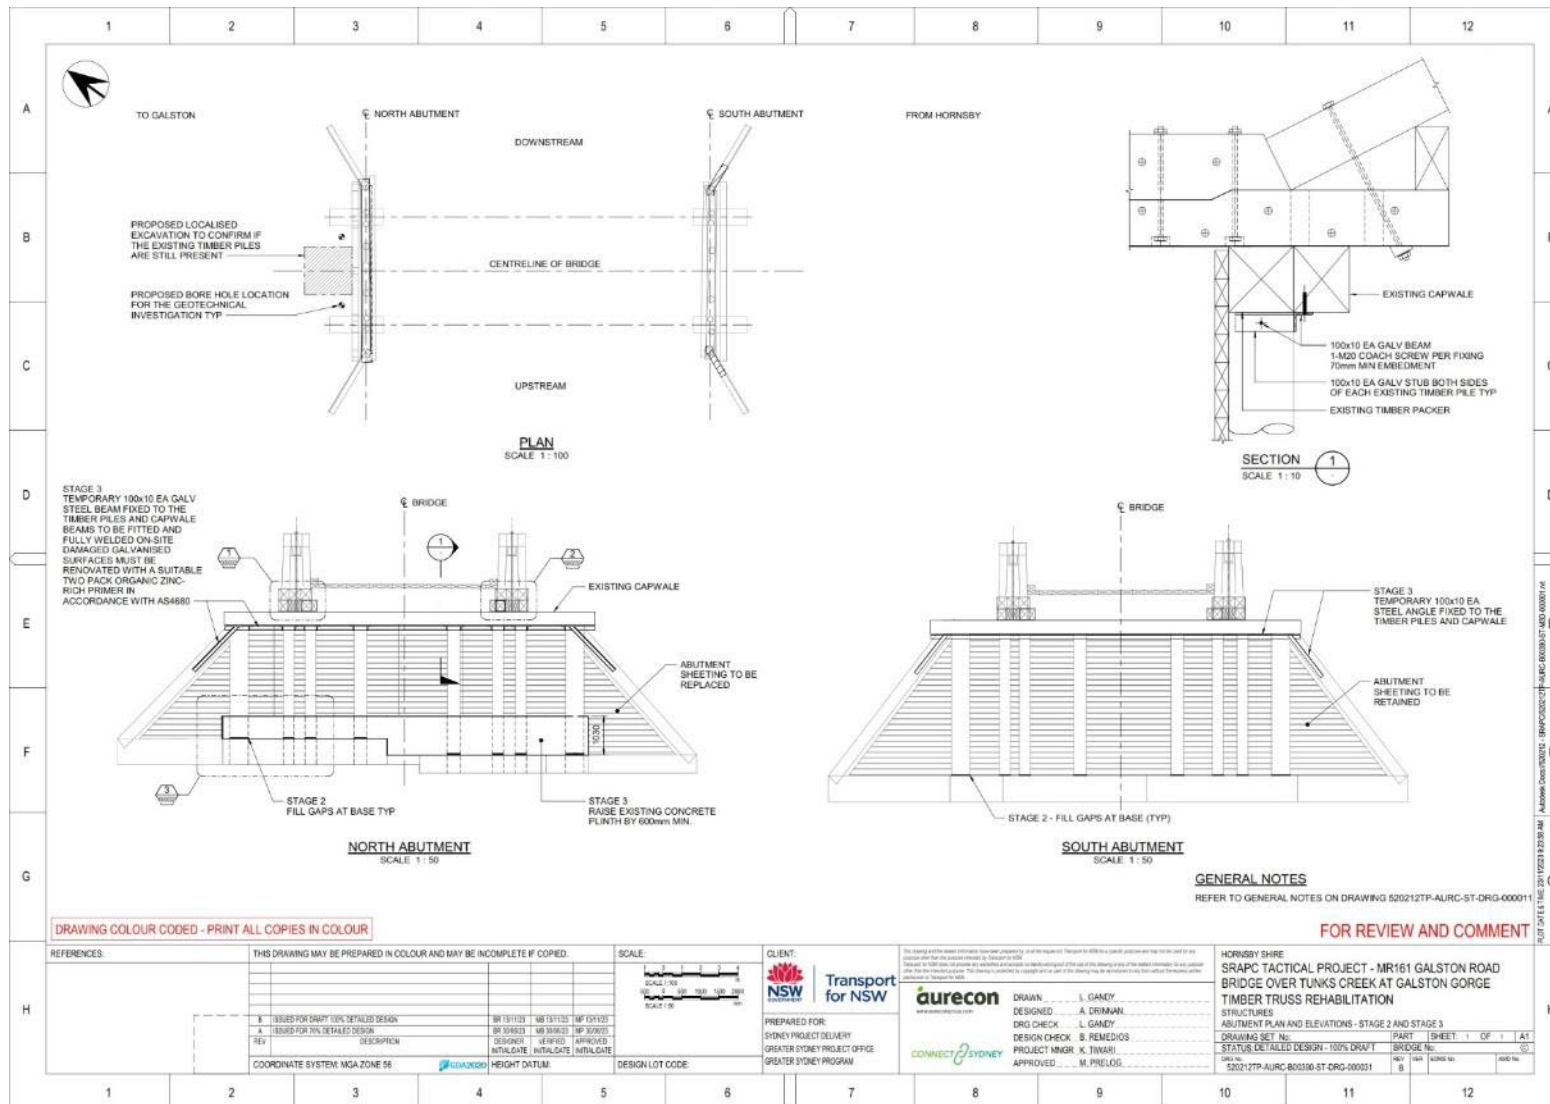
Structures abutment plan and elevations - Stage 2 and Stage 3: 520212TP-AURC-B00390-ST-DRG-000031 (Source: Aurecon)
